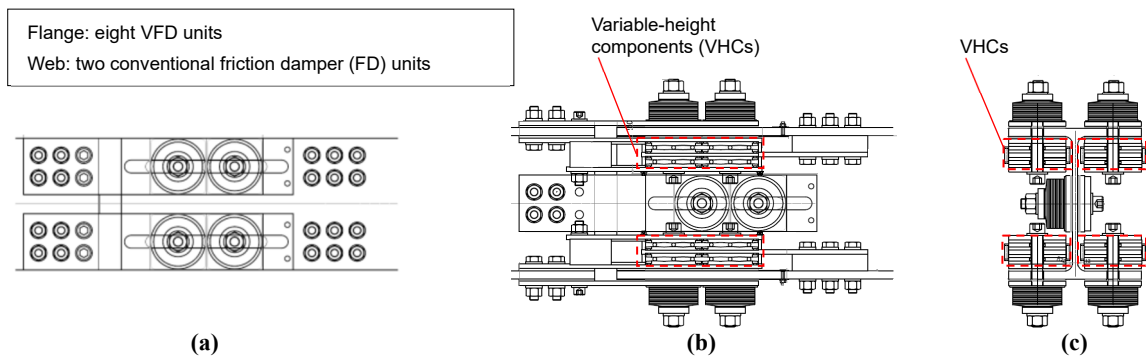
Drawings of the variable friction damper (VFD) specimen used in the full-scale tests⁴⁴: (a) plan view of the flange part; (b) side view of the web part; and (c) section view
